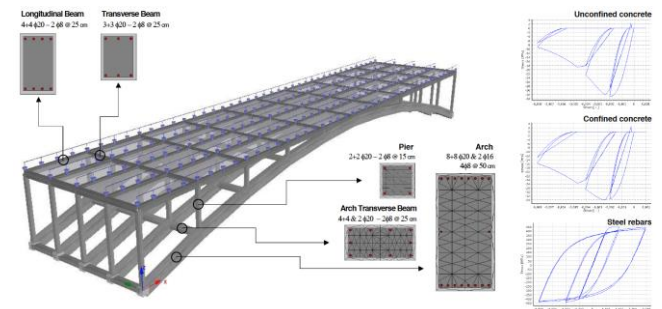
RC arch bridge FE model, with adopted constitutive laws for unconfined - confined concrete and steel rebars.
